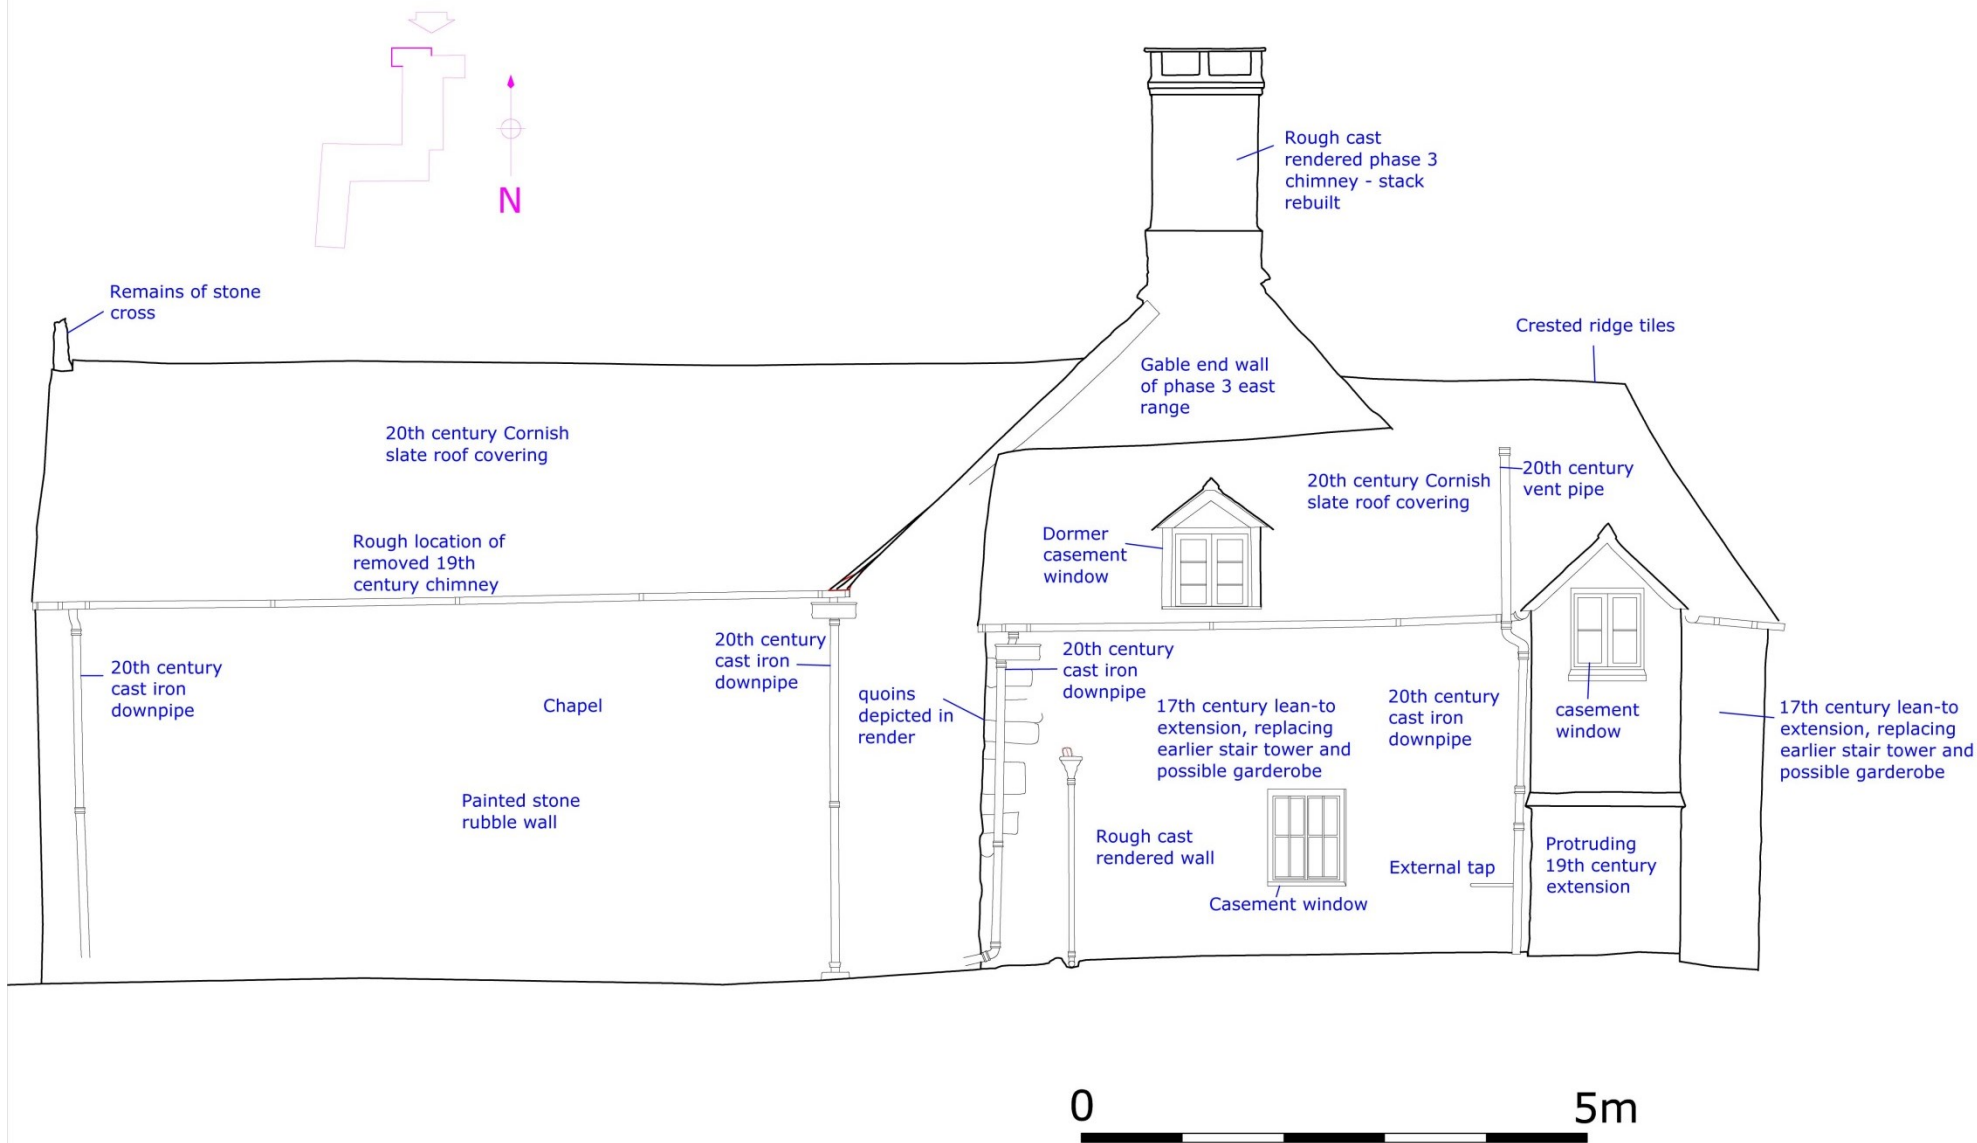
Manor House: North elevation of Chapel Wing and East Range
